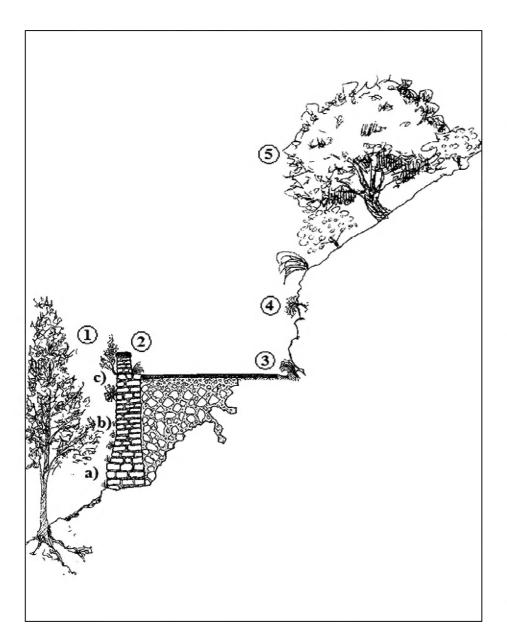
Cross-section of the habitat of the Monte Pellegrino road system: 1) retaining wall (a – base plinth; b – sloping face; c – vertical face); 2) downhill-side road margin (masonry guard-walls or parapets); 3) uphill-side road margin; 4) rock cut slopes, 5) natural slope.
